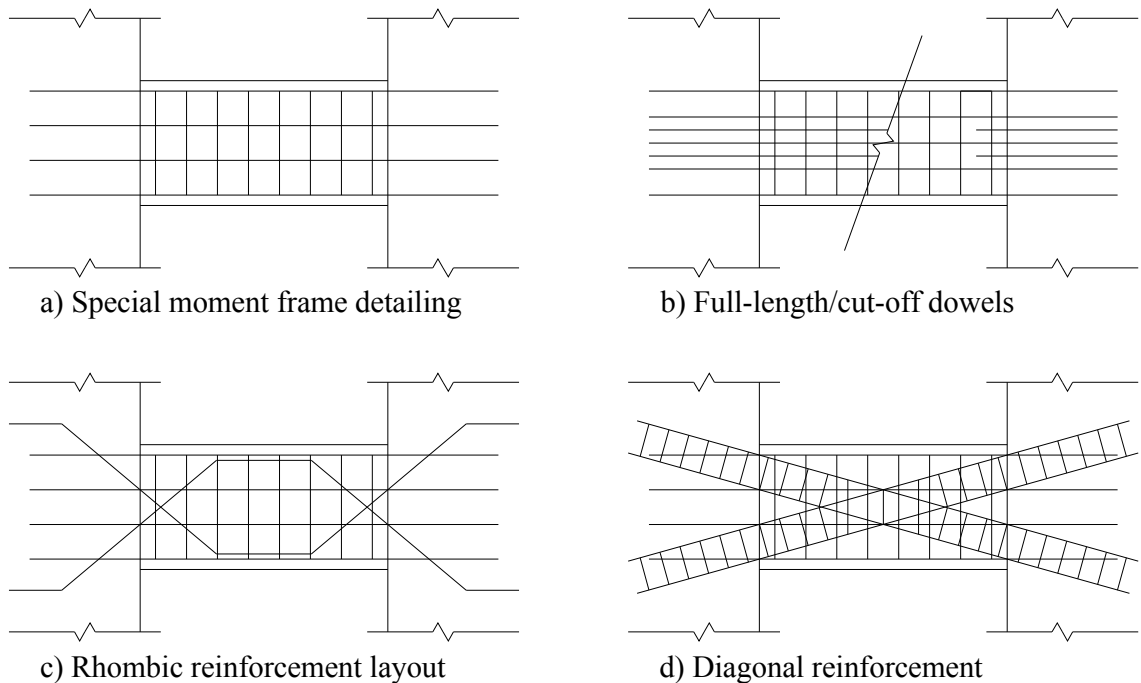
Alternative coupling beam reinforcement schemes (Lequesne et al., 2009)
